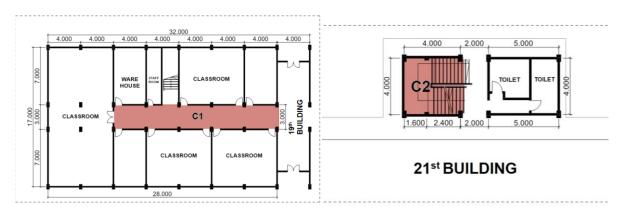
Floor Plan Location of Research Cases (Author, 2023)
